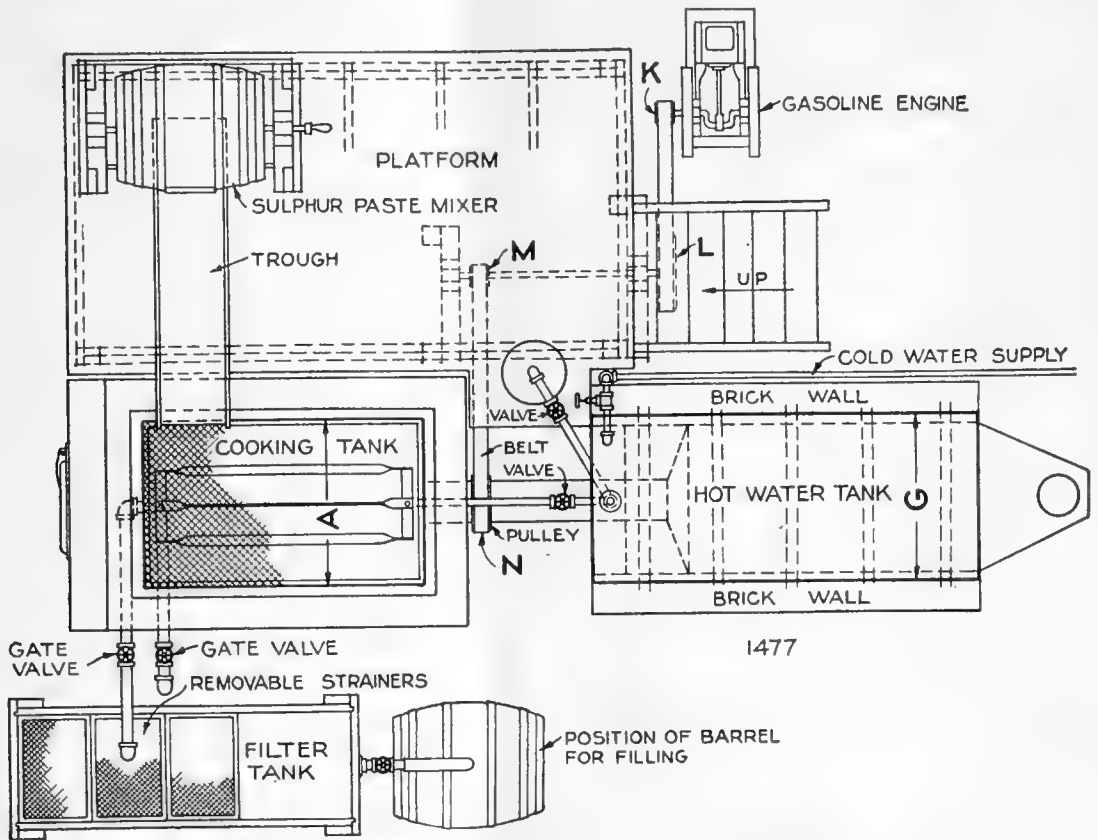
Plan of single-cooker furnace type of lime-sulphur plant.
